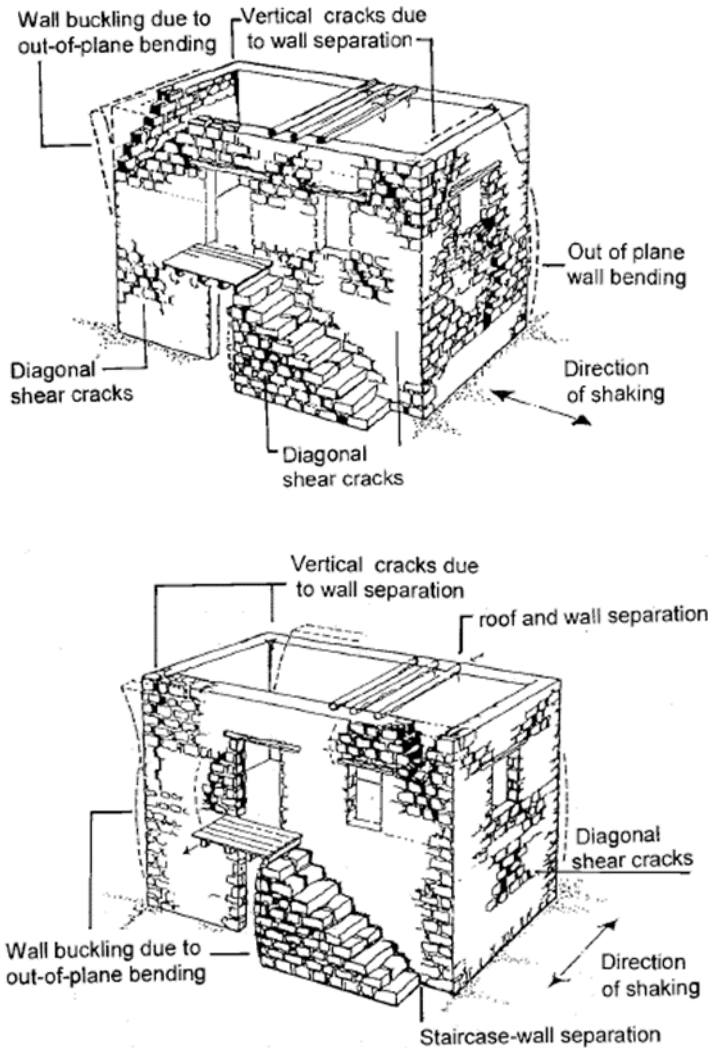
Typical earthquake damage of masonry structures due to different direction of shaking (Pitta, 2000).
